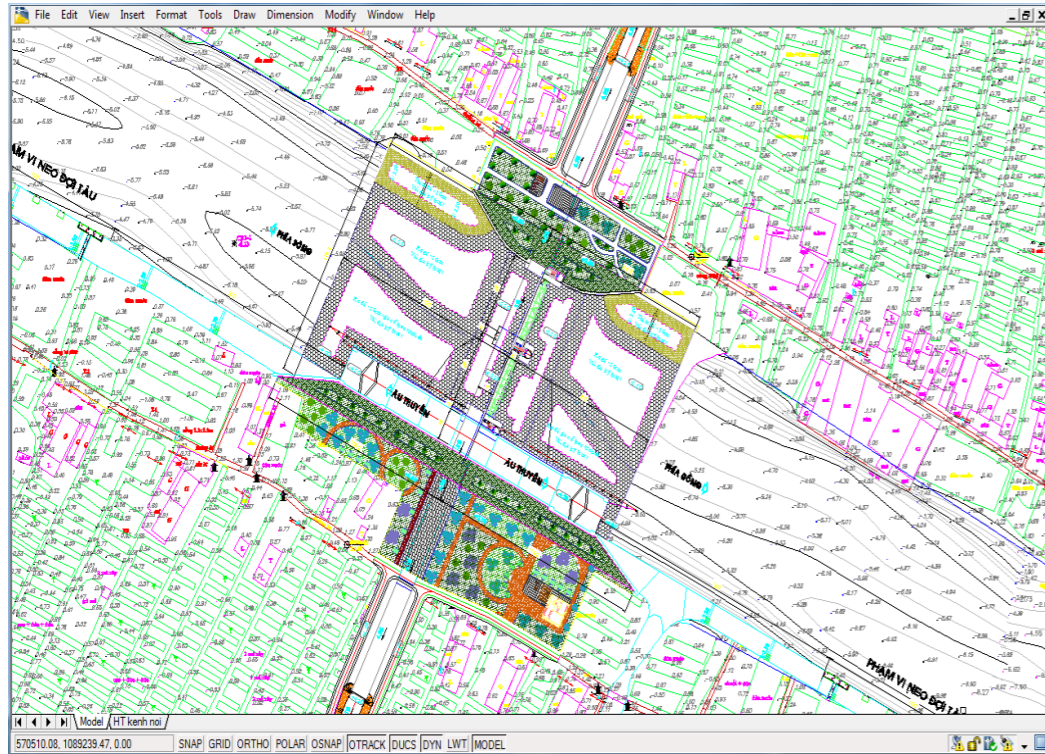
Retaining walls and connected embankment of Cai Be sluice gate
